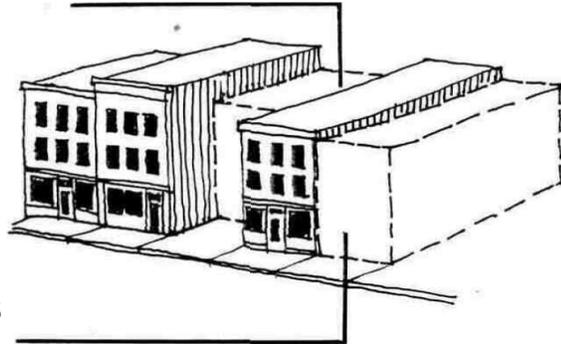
More Detail Needed Example, Wayzata Design Guidelines, 2004.
